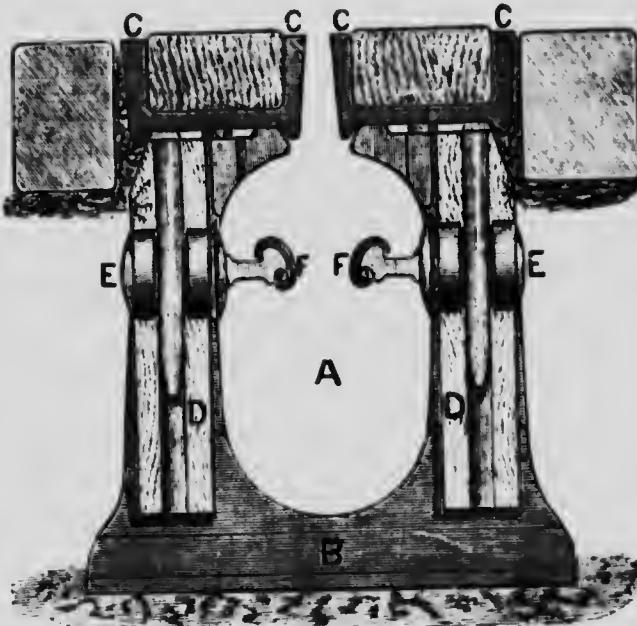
,532.—Some Details of the Blackpool 1885 Conduit.
